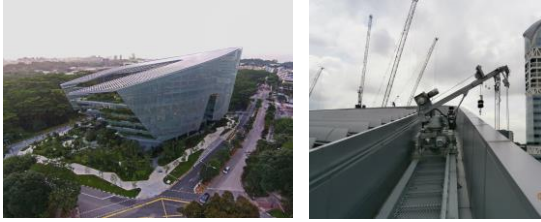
The façade access system of Lucasfilm Singapore's Sandcrawler Building is designed as an integral part of the inclined roof structure
